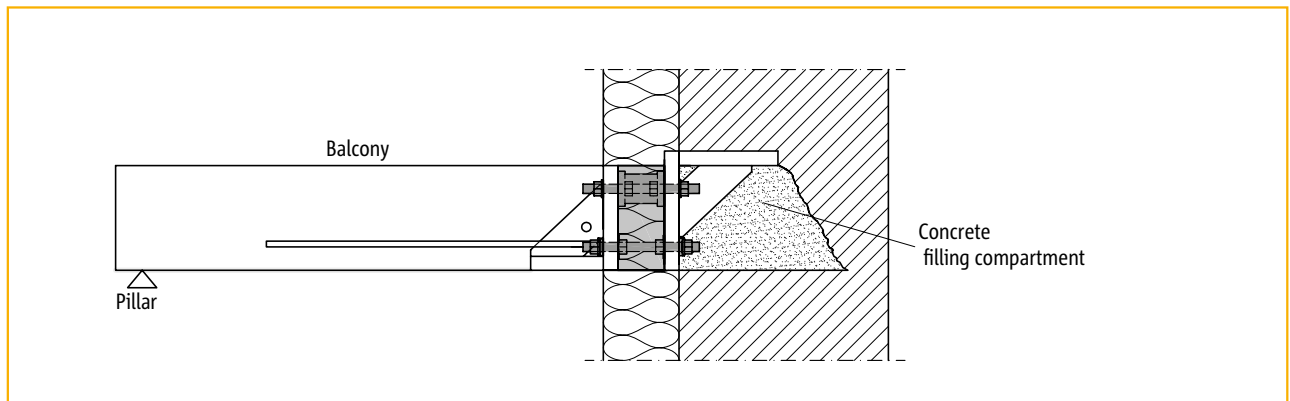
Balcony supported, connected with KSTZ and KSTQ modules (in-situ concrete)
